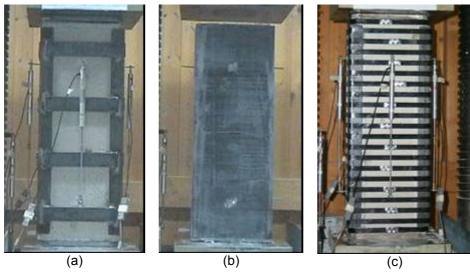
Strengthening techniques: (a) Steel Jacketing, (b) FRP encasement, (c) CAM jacketing.
